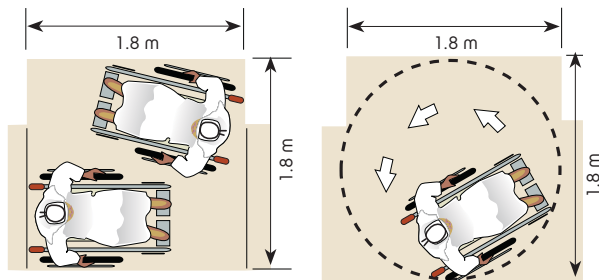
Wheelchair User Passing and Turning Dimensions
